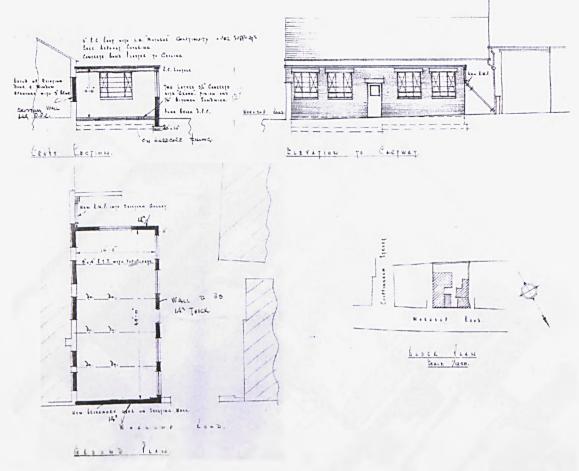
Planning drawings for an extension to the former Weigh House cast steel furnace, with information on construction and window layout (SCA).
